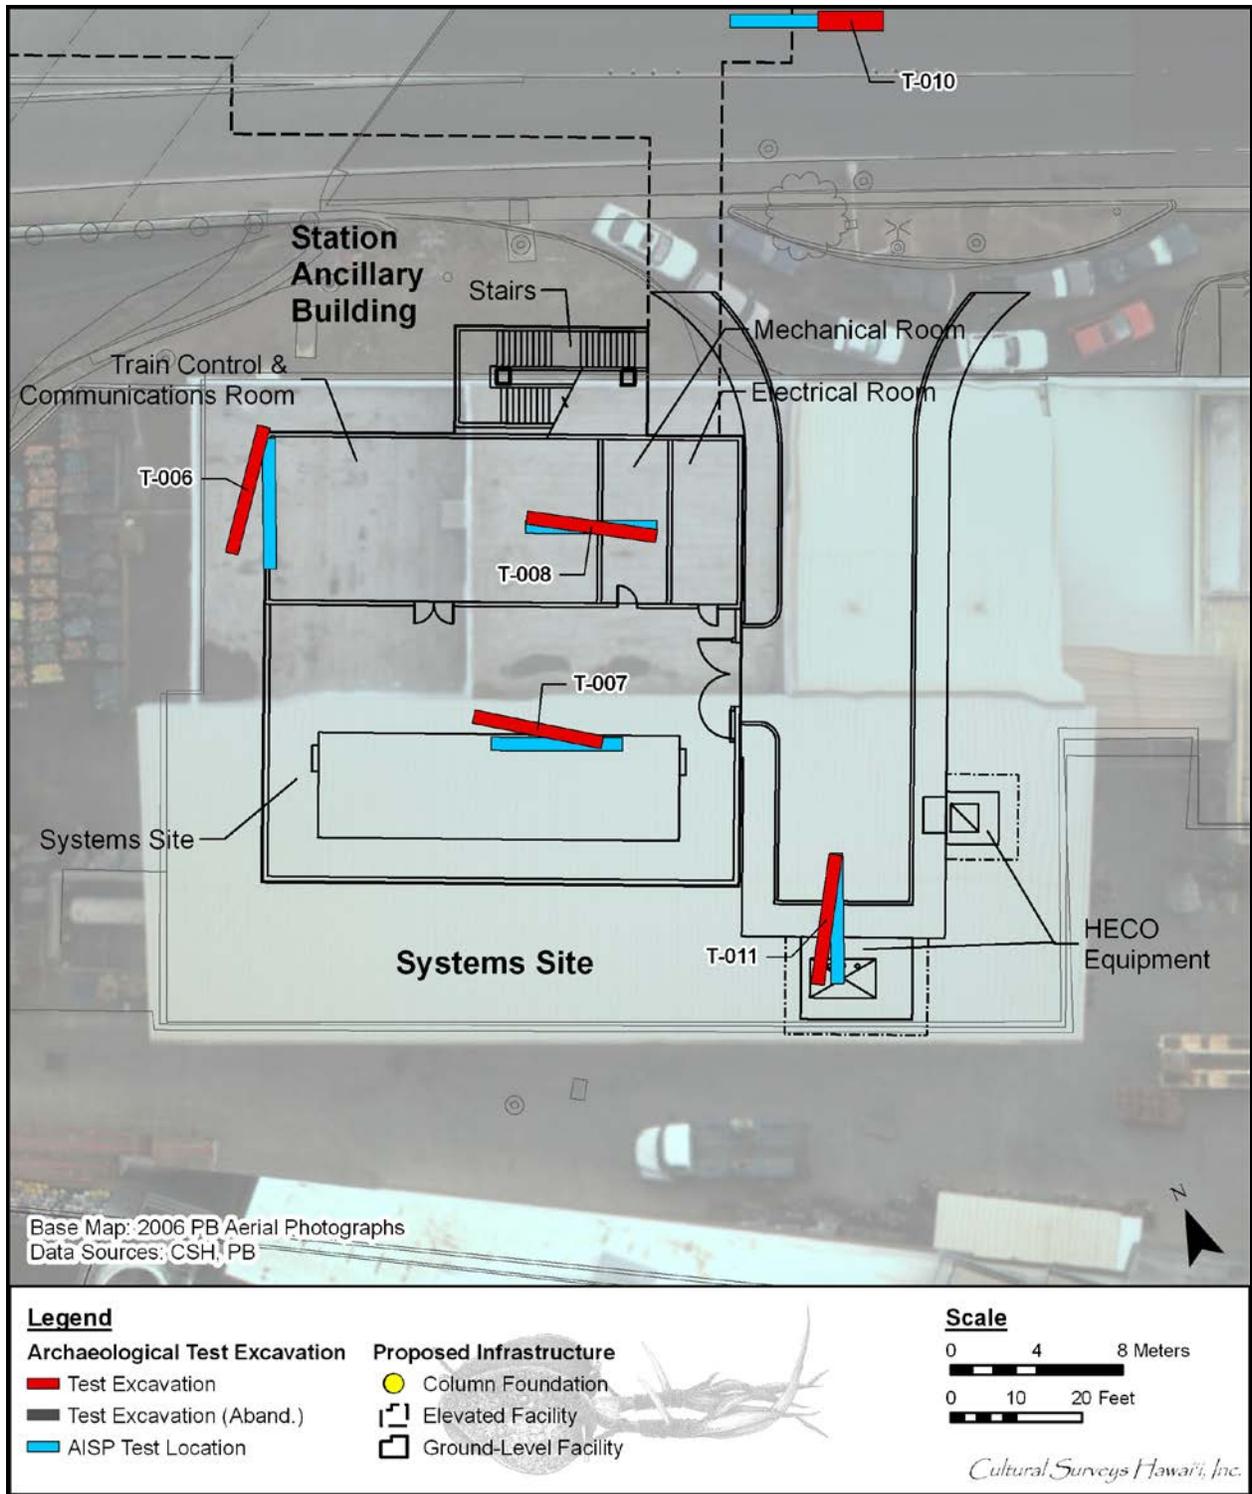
Middle Street Transit Center Station, detail of (makai) Station Ancillary Building showing locations of proposed AISP and actual AIS test excavations
